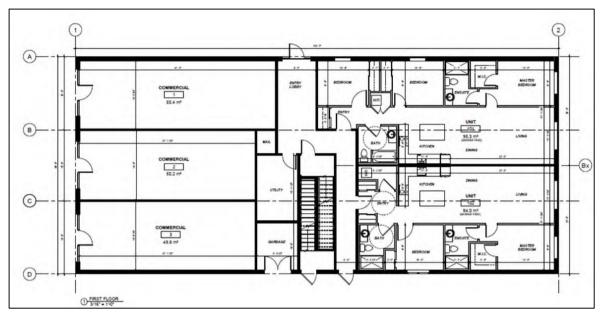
Preliminary Mixed-use Building First Floor Plan (Jason Pizzicarola Design - Architects Inc.)
